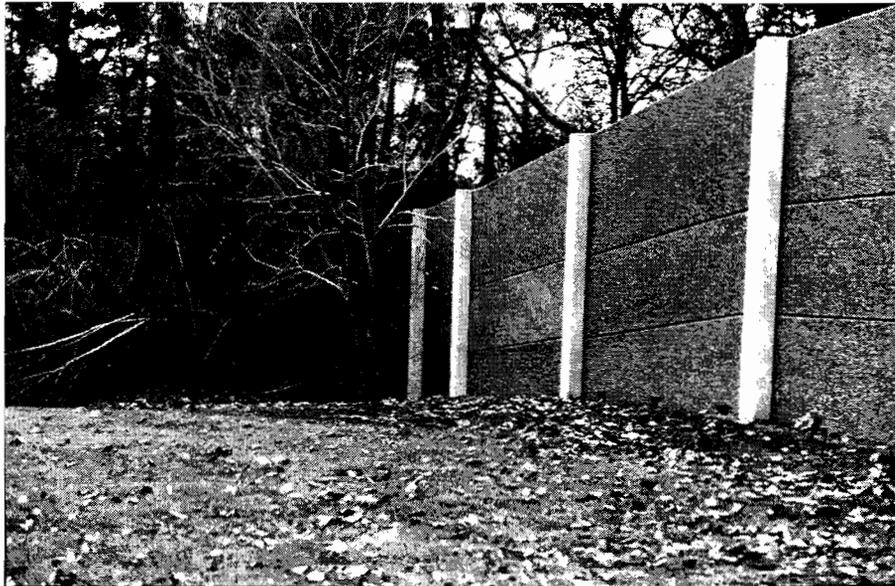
Example of Prefabricated, Separate Noise Barrier System (Houston District, precast concrete posts and precast concrete panels)
